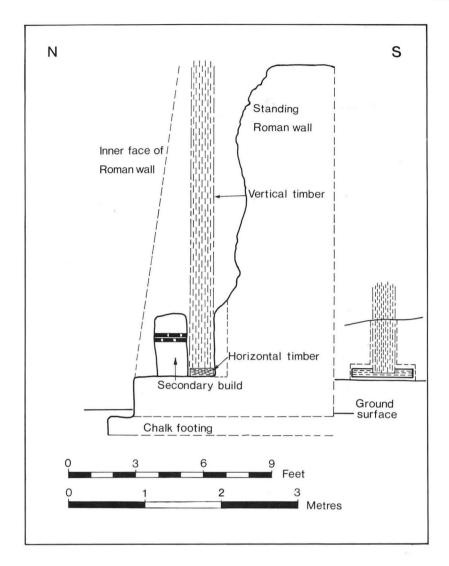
South wall of fort: section showing hole cut for inserted timber. Scale 1:50.
